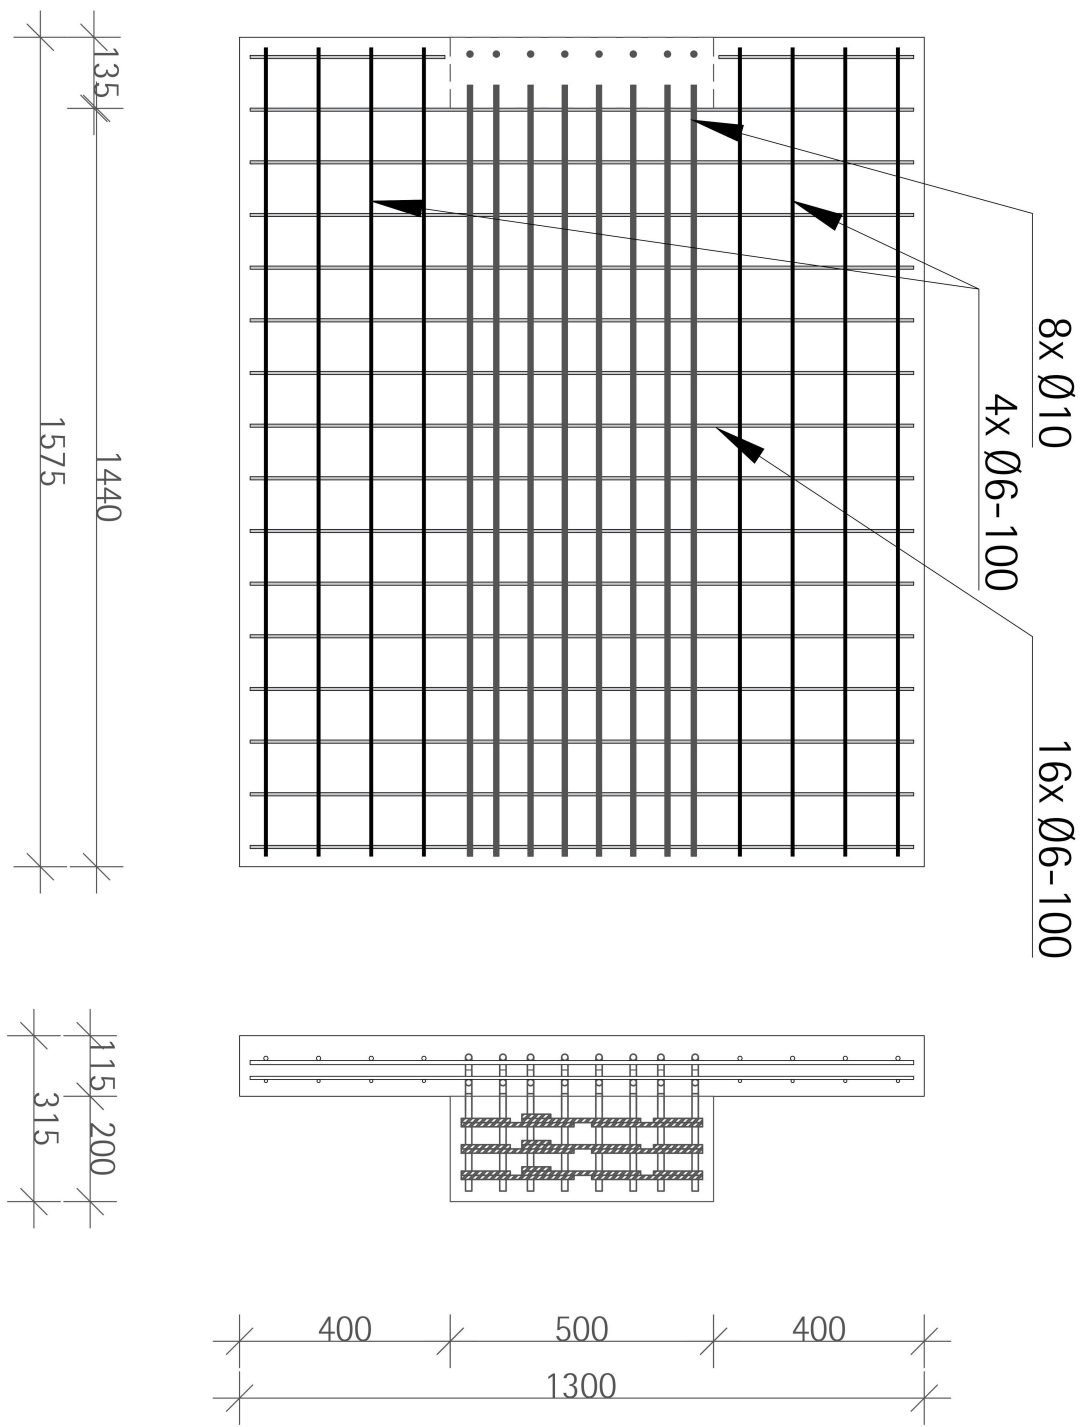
Bottom reinforcement configuration and front view of final design remake Hi-Con balcony.
